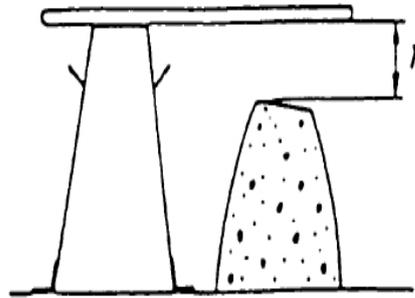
Concept of height h in the slump test (BS EN12350-2-2009)
